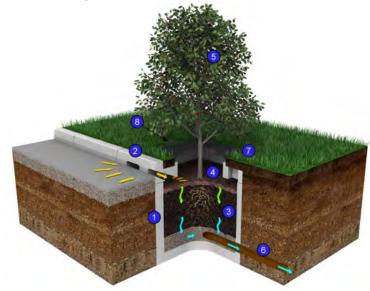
Typical Tree Box Filter (Source: Hydro International, Inc.)
